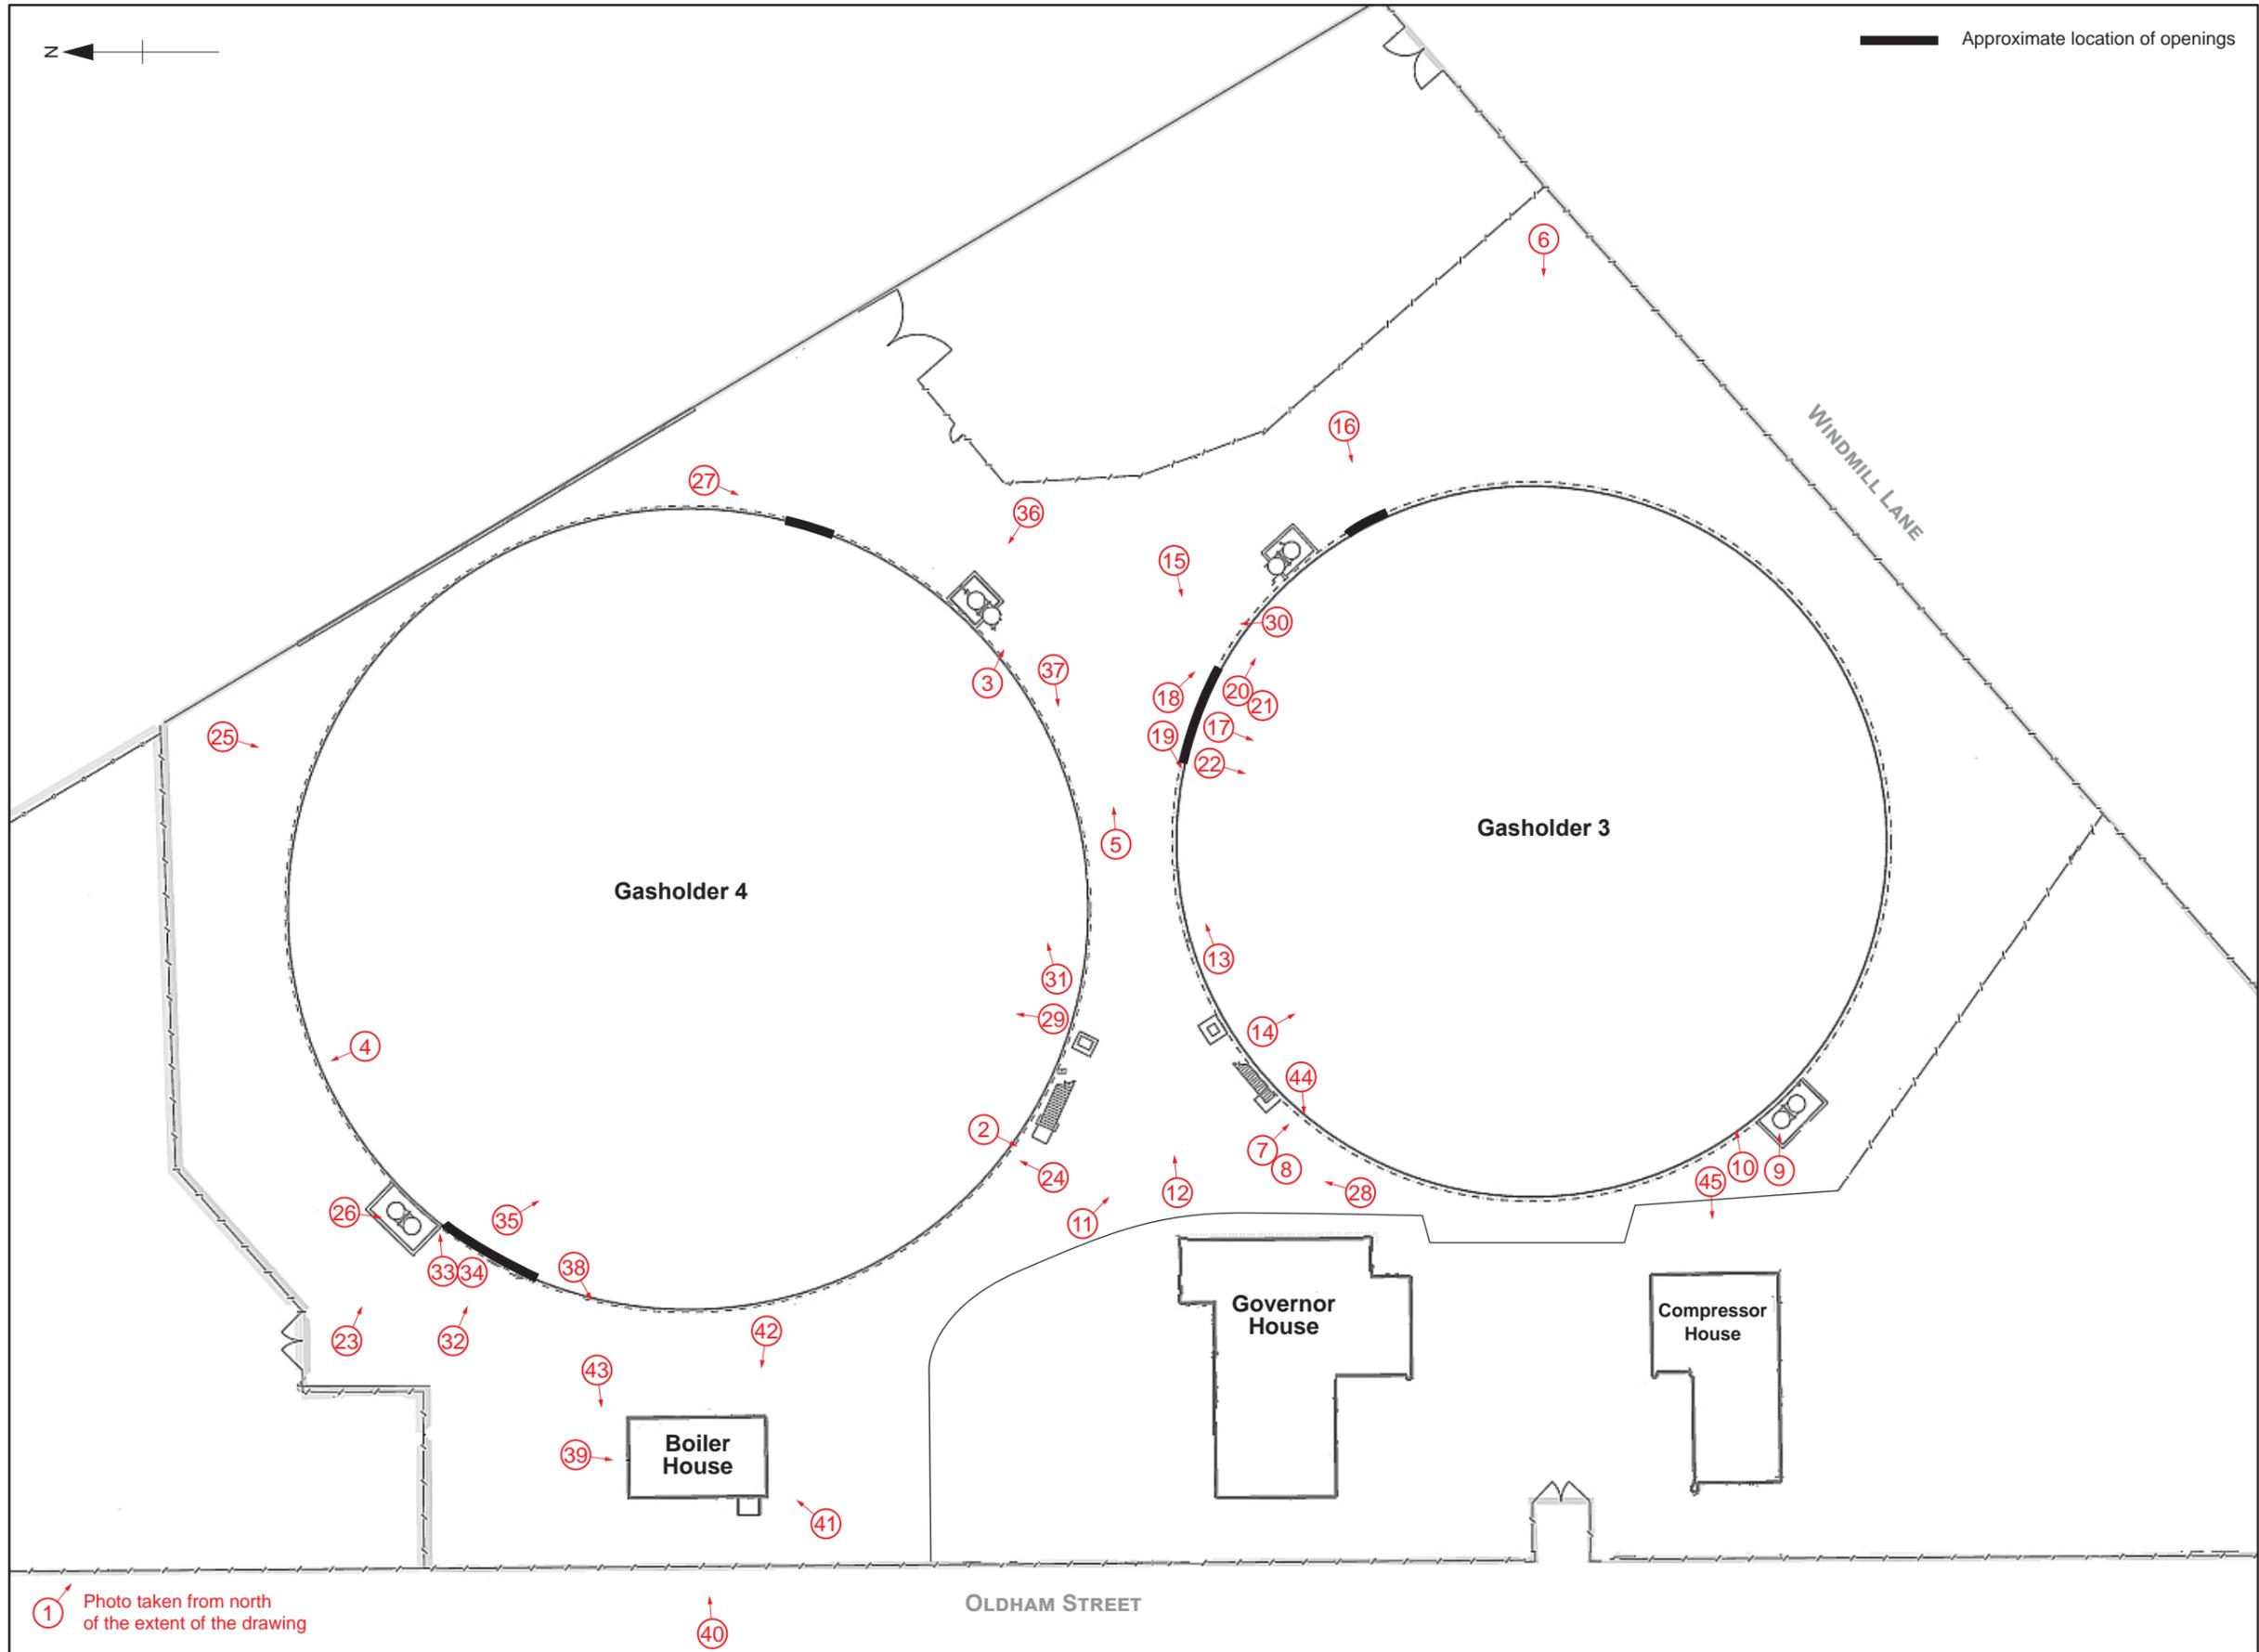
Photograph locations of plates. Plan based upon the National Grid Drainage Plan
